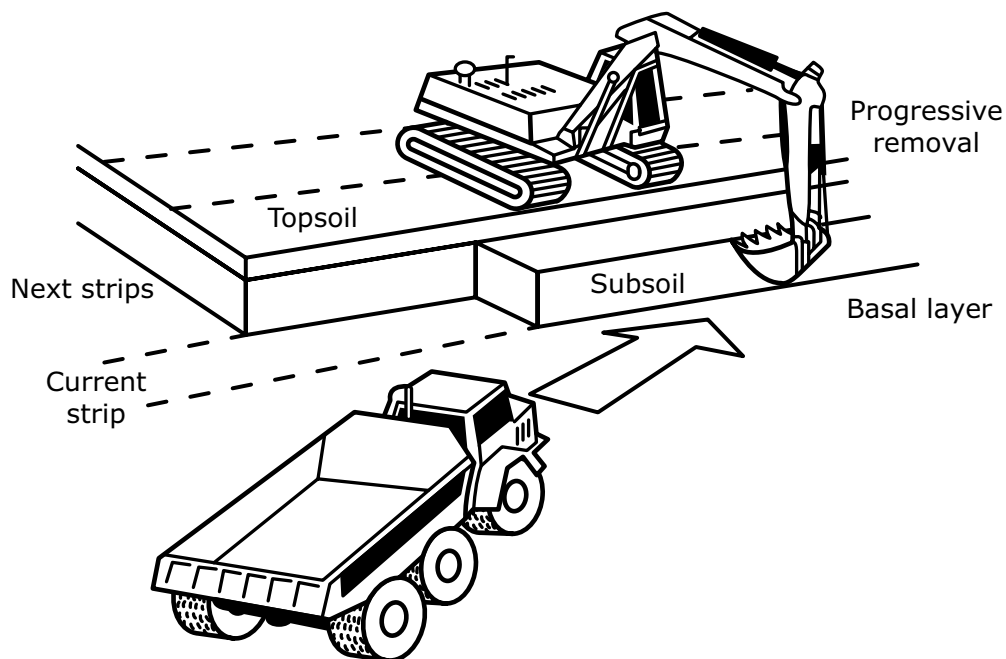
Stripping with excavators and dump trucks: removal of subsoil from a strip.
